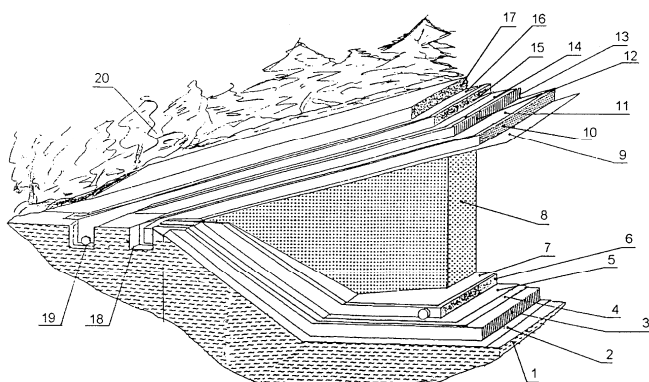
Scheme of waste storage in clay working [1]; 1 – covering layer covered with vegetation; 2 – drainage layer; 3 – collective well of drainage water; 4 – drainage ditch; 5 – drainage run-off to receiving water
